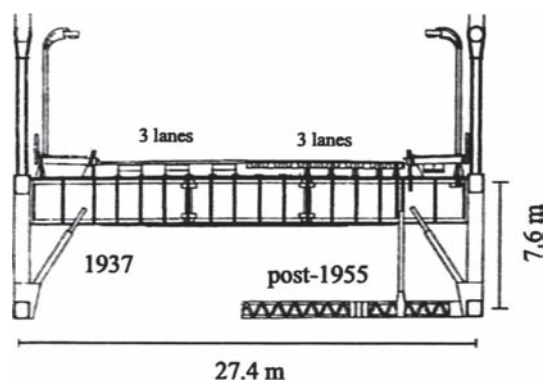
Deck section of the Golden Gate Bridge.
